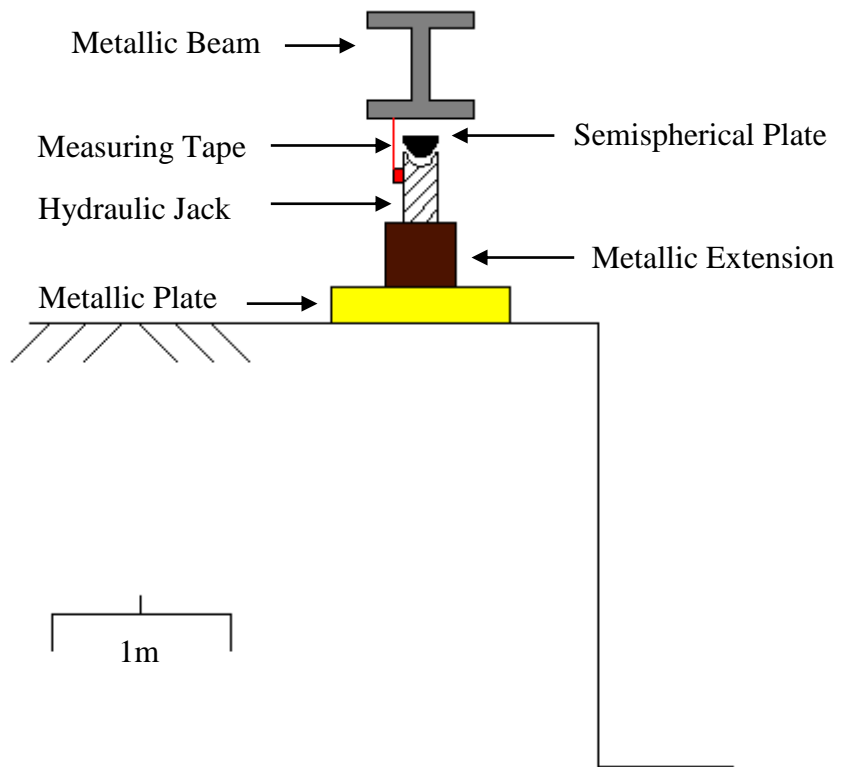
Drawing of the loading mechanism (mobile parts).
